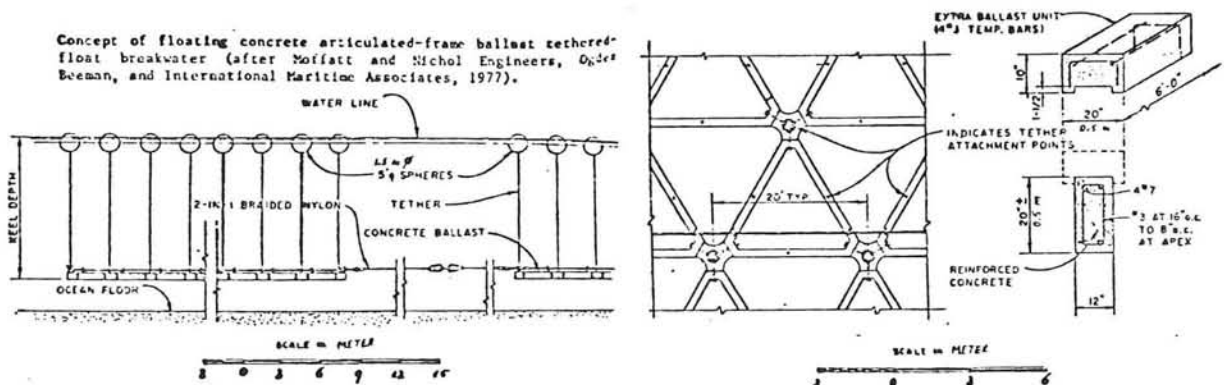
Concept of floating concrete articulated-frame ballast TF-breakwater.
